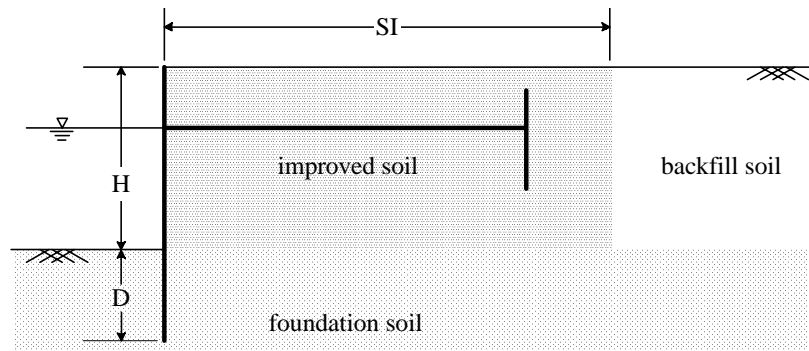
Definition Sketch Of An Anchored Sheetpile Bulkhead With Soil improvement
